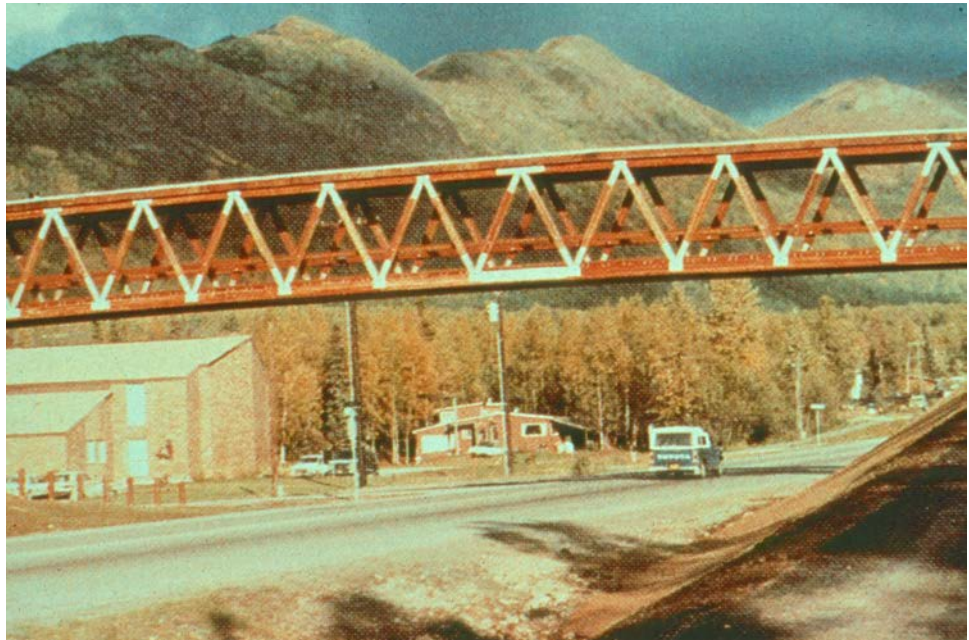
Parallel Chord Truss Pedestrian Bridge (Eagle River, Alaska)
